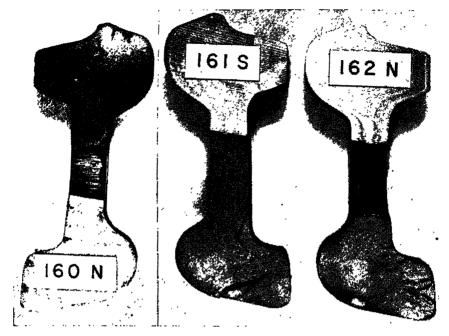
Fractures of 133 RE Head Contact Bars. Cracks on bars 160 N and 162 N progressed to oval bolt holes.
